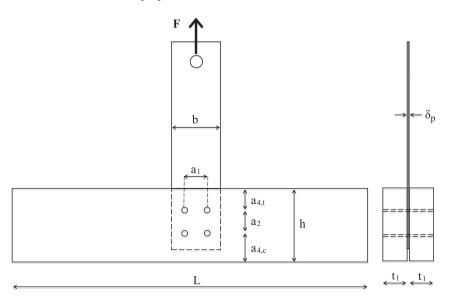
Geometrical configurations of the tested steel-to-timber connections.
